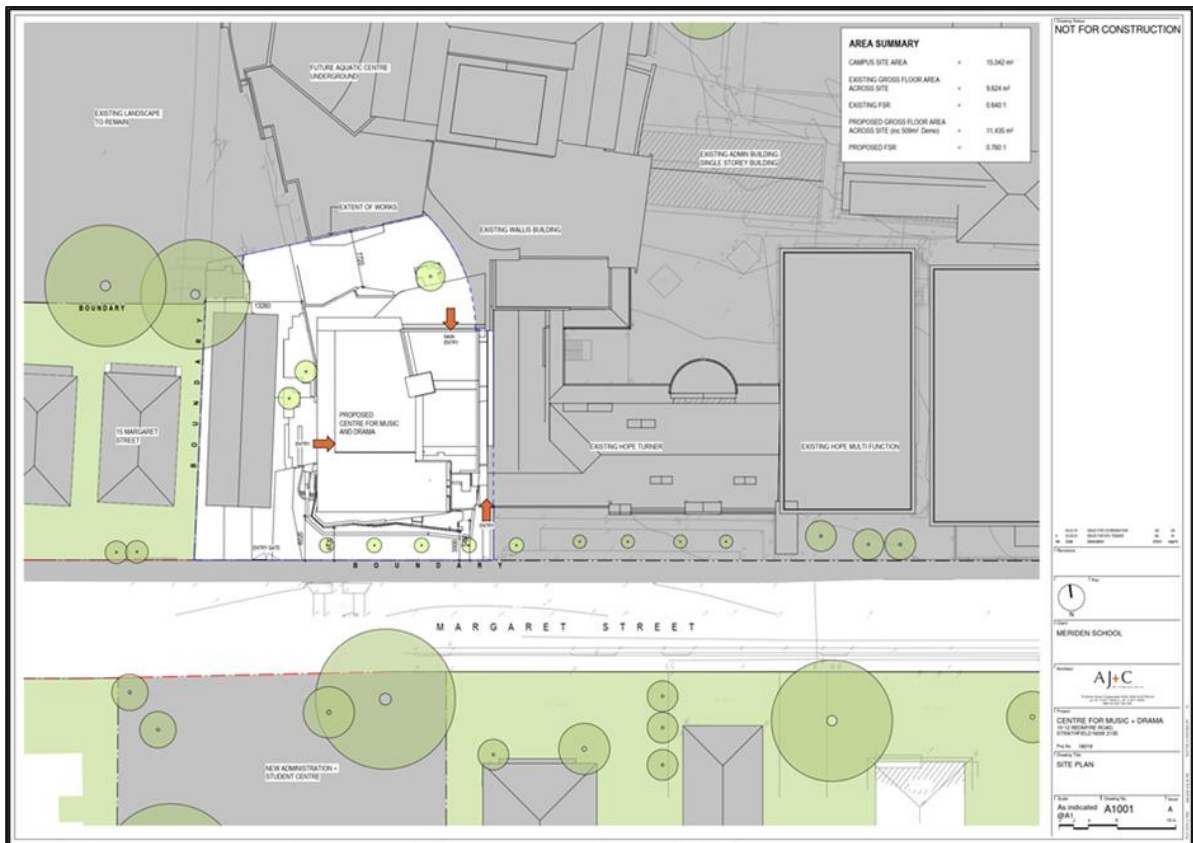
Senior Campus Centre for Music and Drama Layout (Site Plan)
